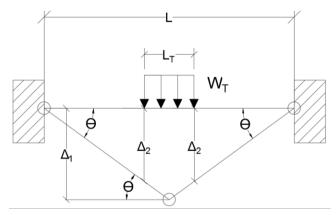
Plastic Hinges at Midspan and End Sections of a Partially-Loaded, Single-Span Fixed Beam
